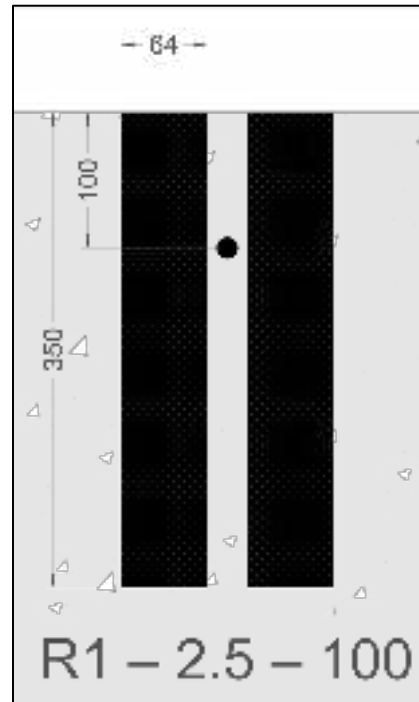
R1 - 2.5 - 100 plan view. Source: Own.
